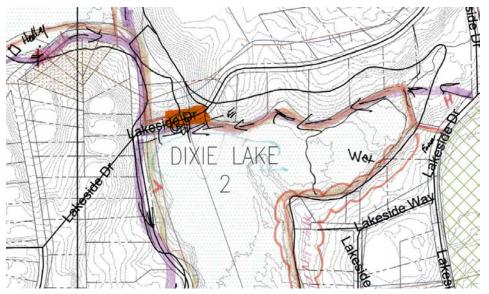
(C): Location of Concrete Bridge highlighted at Dixie Lake 2
